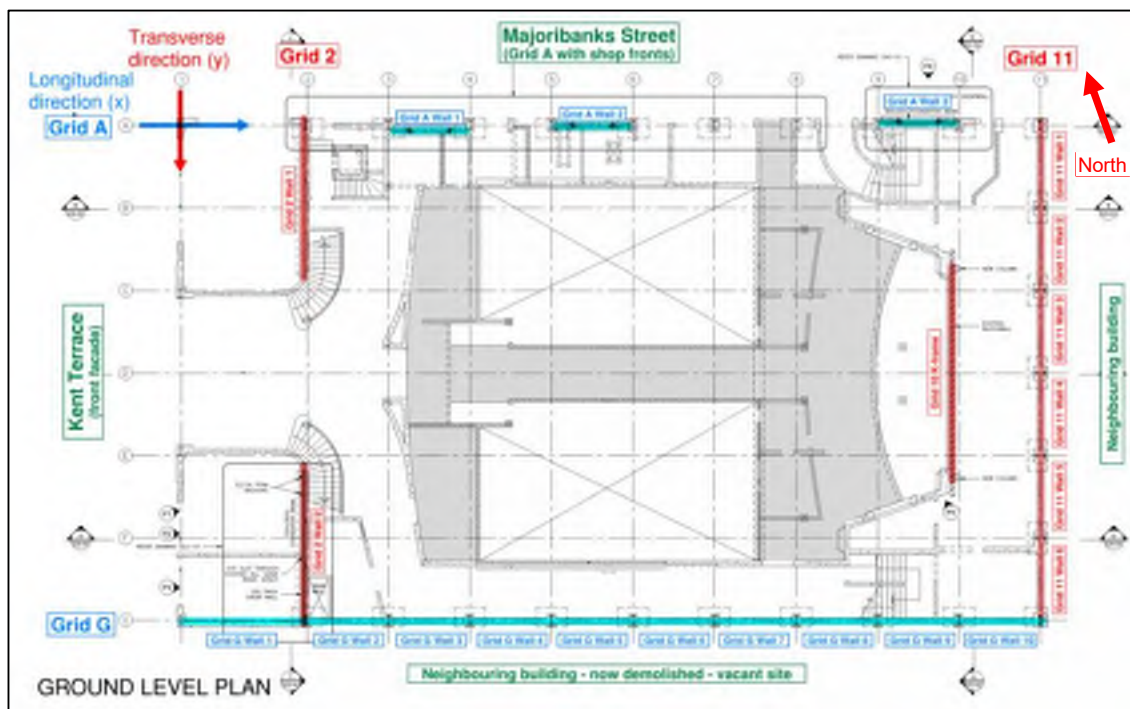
Ground level plan from 2009 structural drawings showing building grid numbering system and orientation with primary lateral resisting walls.
